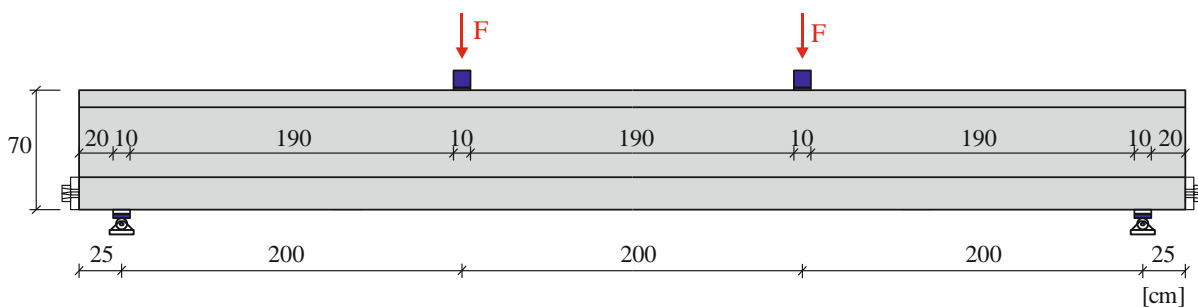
Load testing arrangement. Dimensions in cm, 1 cm ~ 0.39"
